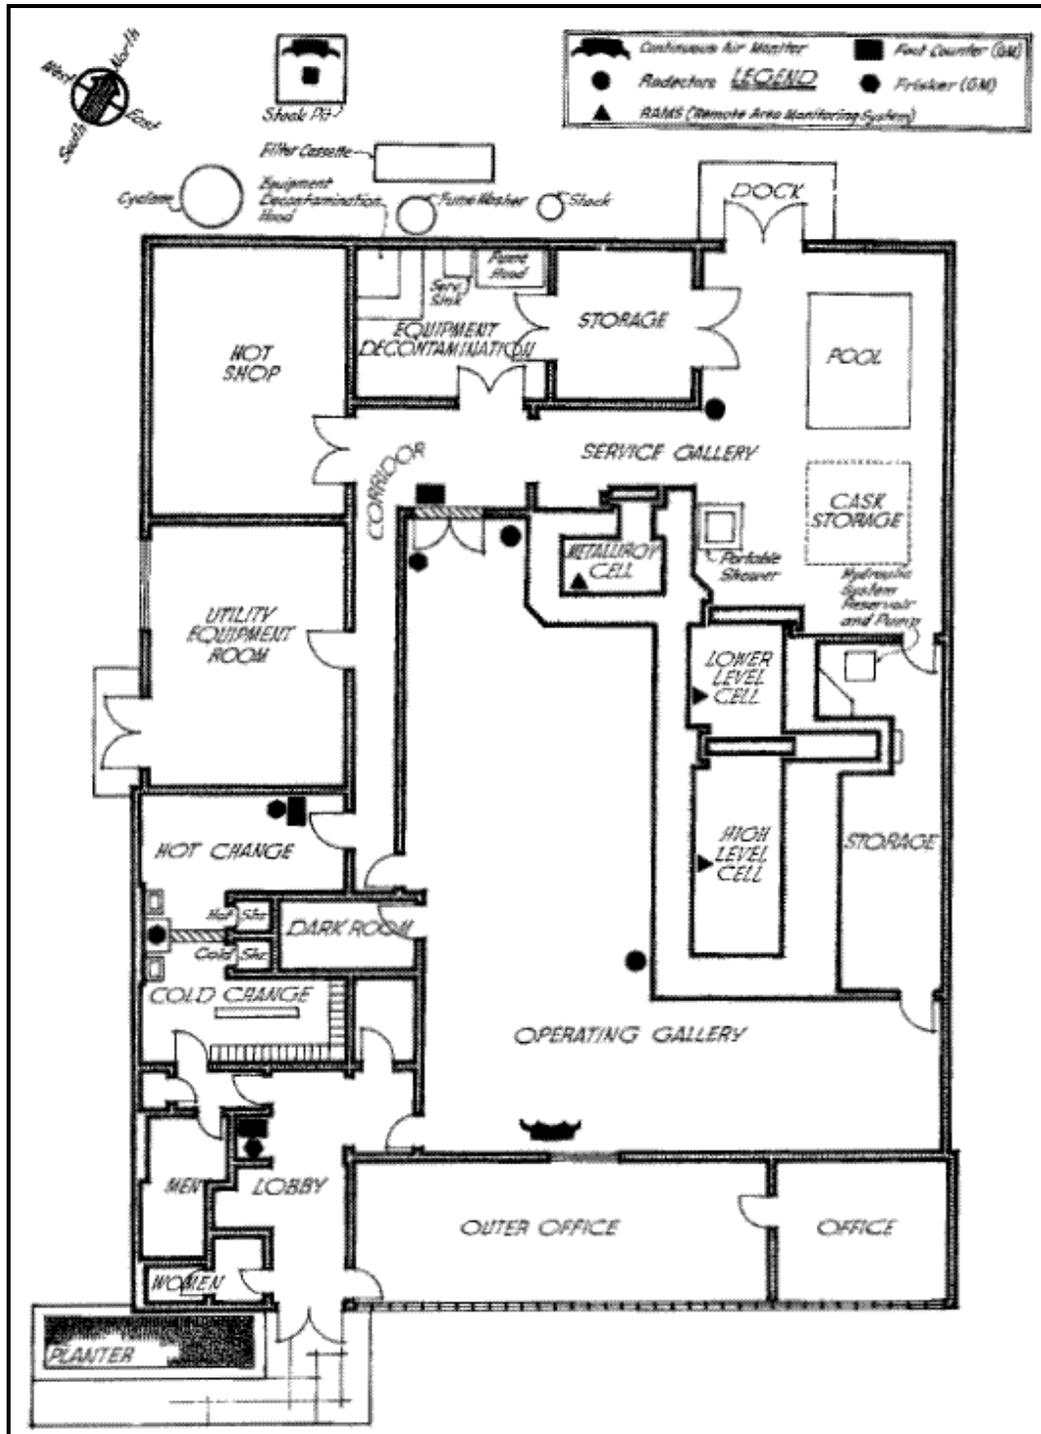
HCF floor plan about 1960 (GDC and H&N 1960, p. 89).
